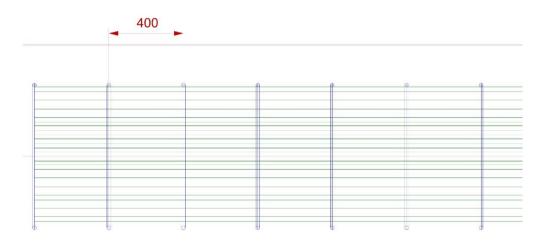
Part of a longitudinal section of the pile, displaying the stirrup spacing. Units in mm.
